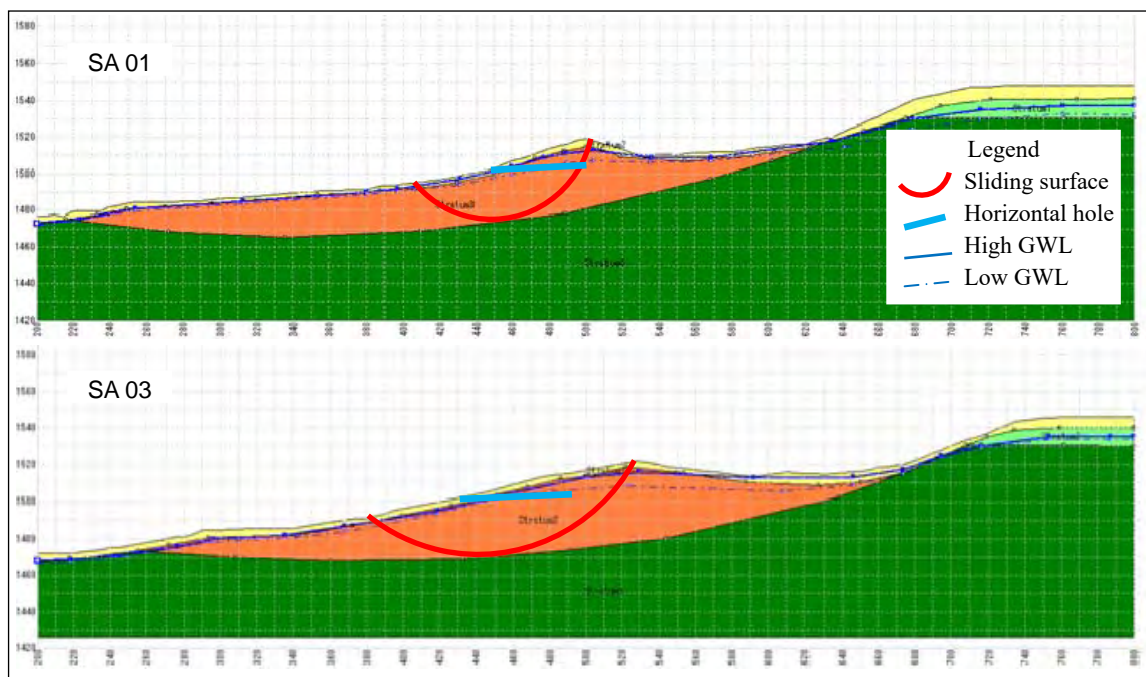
Possible locations of horizontal holes for Arapi site on sections
